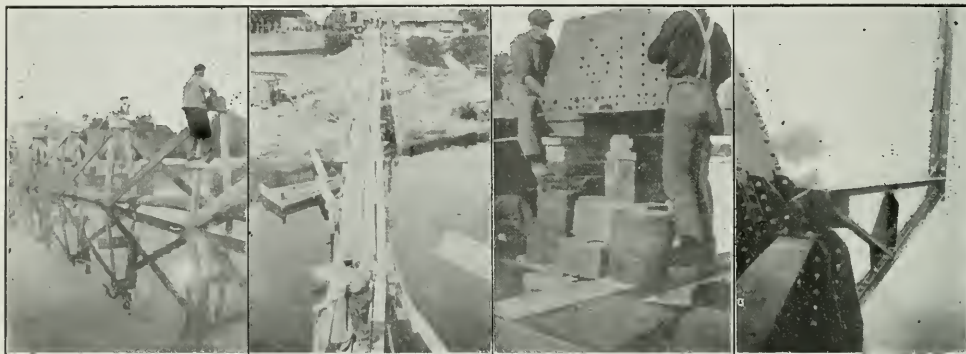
Views of Bridge Construction—Method of Placing 10-in. C.I. Water Main—Chute for Transporting Concrete to Piers—Rivetting a Bottom Chord Splice—Sidewalk Cantilever Adjustment.
